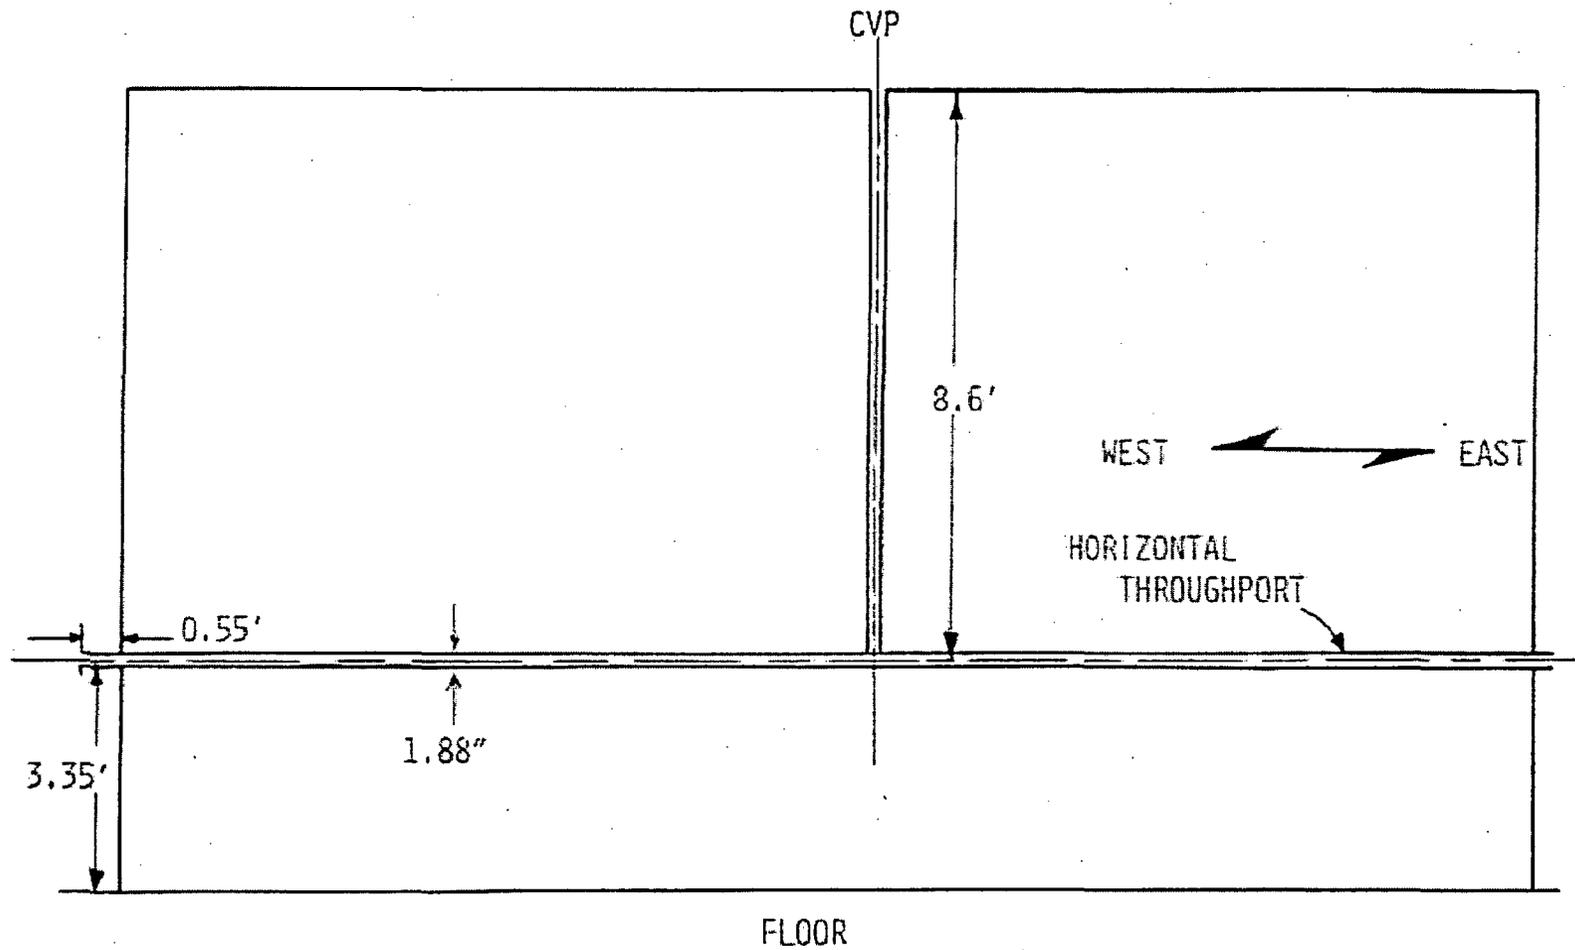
UFTR Cross Section Showing Center Vertical port (CVP) and East-West Through Port (EWTP) Arrangement with Dimensions (not to scale)
